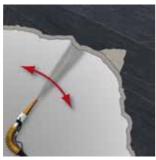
1st shotcrete layer – 1st excavation stabilization and adhesive bridge for the 2nd shotcrete layer
